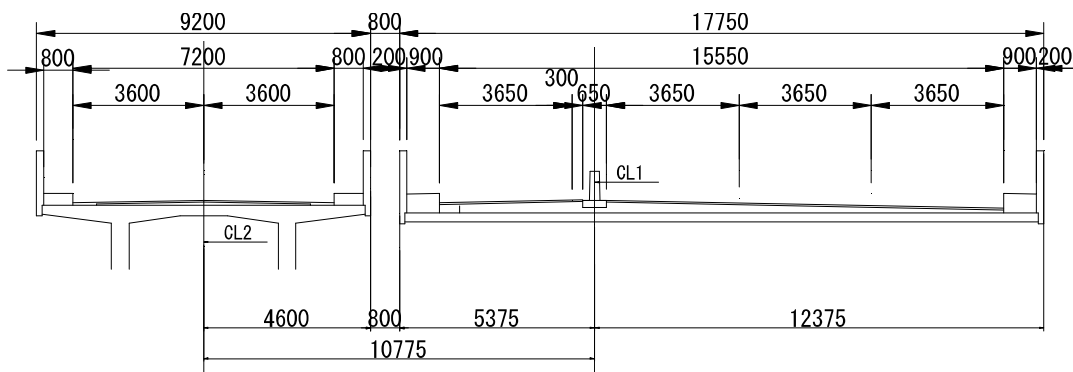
Typical Sections of New and Existing Gumti Bridge
